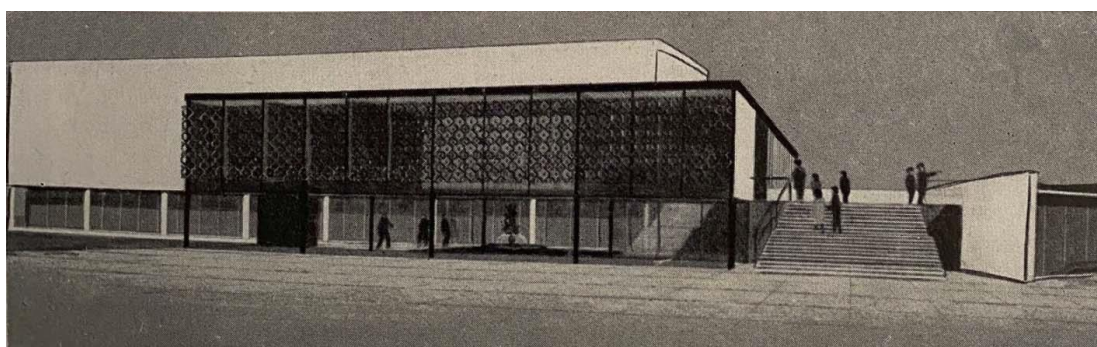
Winner design by architects Ancher, Mortlock and Murray of the 1957 design competition for the reconstruction of the Waverley Council Chambers. The loan for the proposal was not approved in 1958 and, therefore, the project was not constructed. Source: Dowd, B.T. and, William Foster, 1959.
